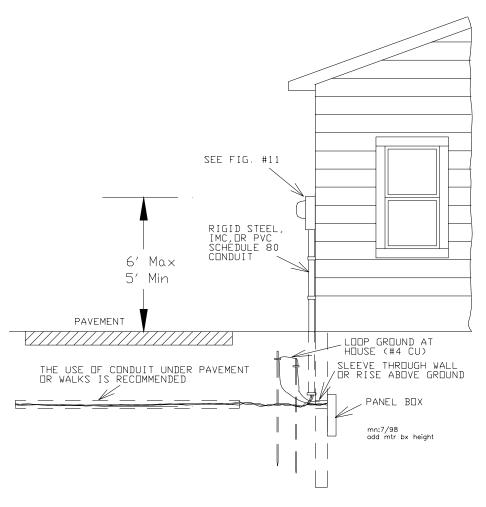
DETAILS OF RISER AND SERVICE ATTACHMENT LOW BUILDINGS - RANCH HOUSES
